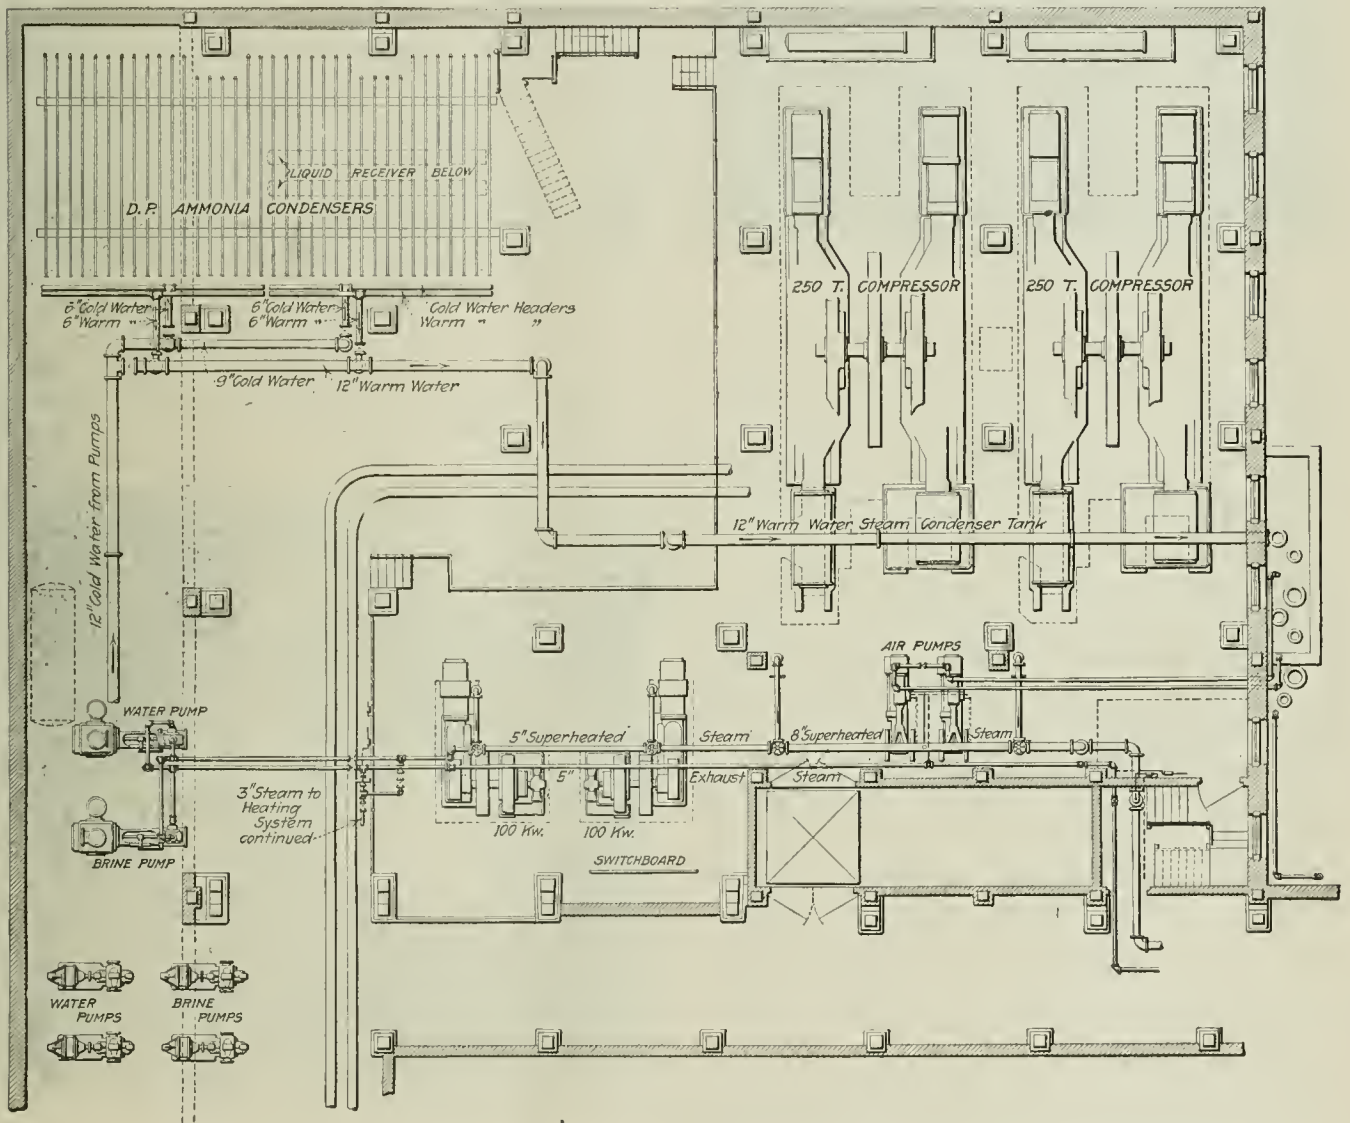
LAYOUT OF EQUIPMENT, CENTRAL COLD STORAGE CO., CHICAGO, ILL.
